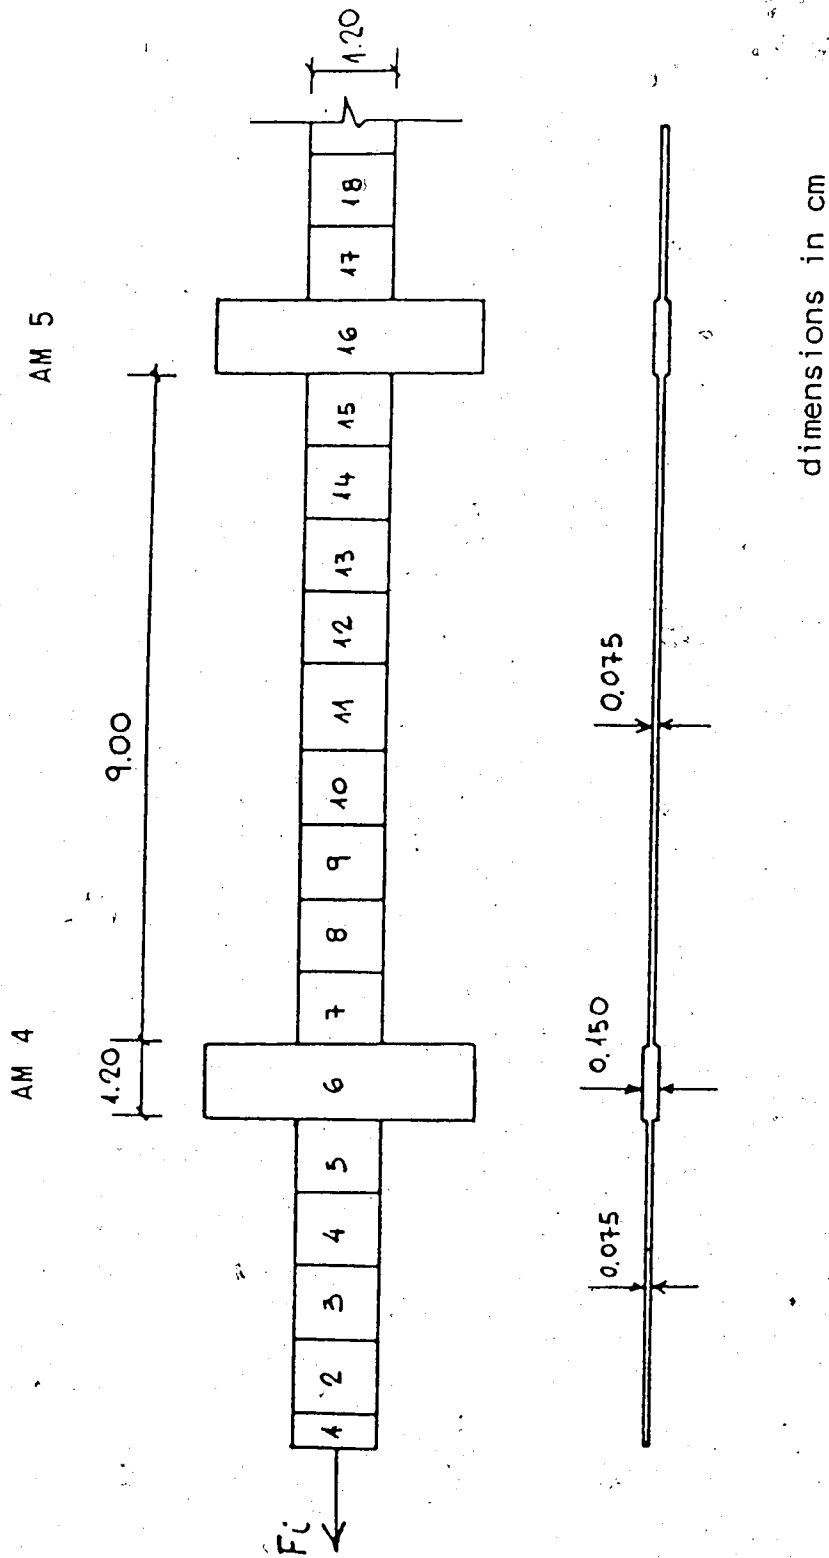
Plan and Cross Section Views of a TNX5001 Tension Member
